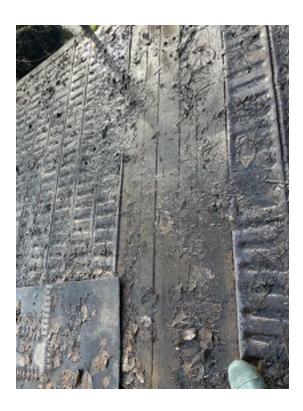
Gordy Jolma No 5 Corrosion/damage on steel deck plate and timber deck plank section.
